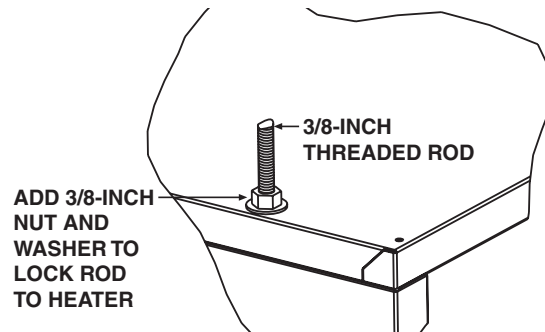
Heater Suspension Using Field-Supplied Threaded Rods
